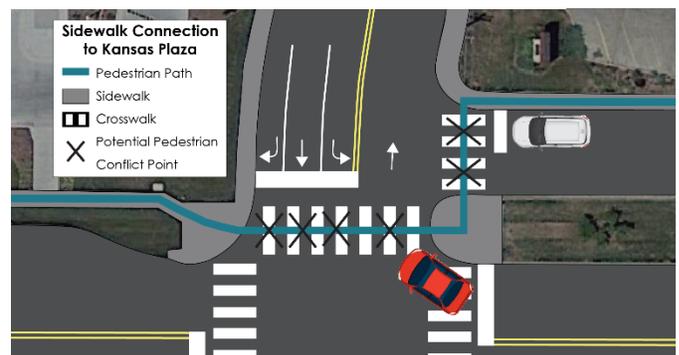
Sidewalk Connection to Kansas Plaza along the north side of Kansas Avenue
